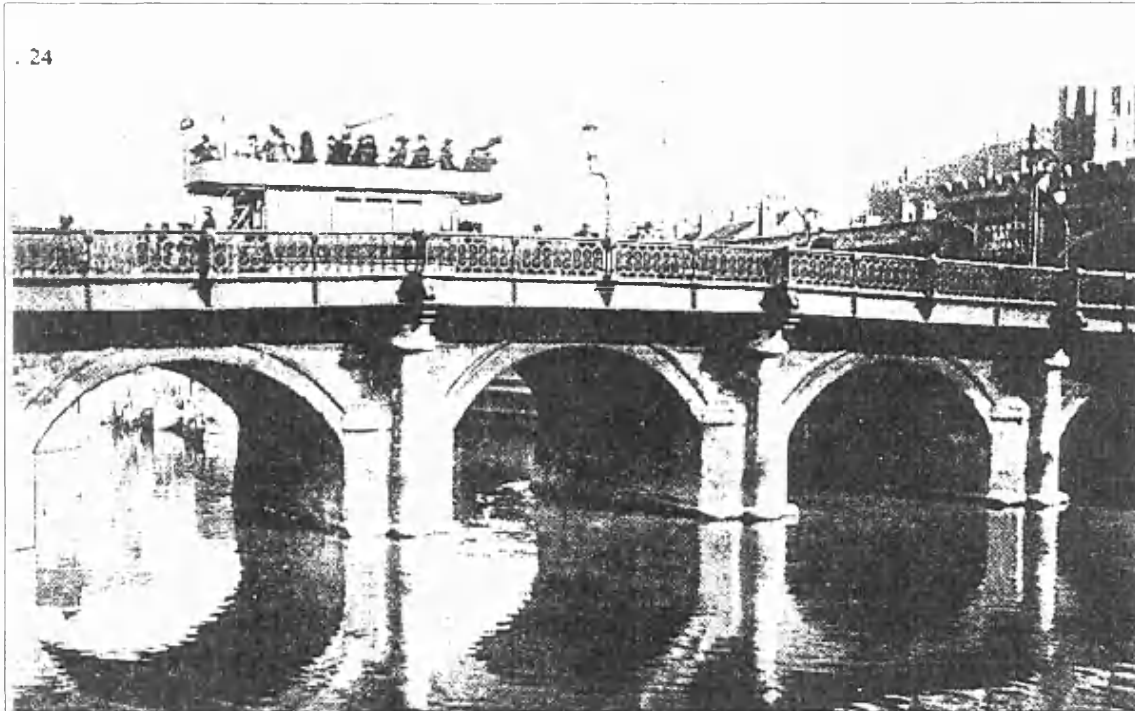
Bath Bridge, c1904. The Telford - Manners widening comprises the beams and balustrades bracketed from supports raised on the main piers. (Postcard, Hodge & Co., Publishers, Bath).
